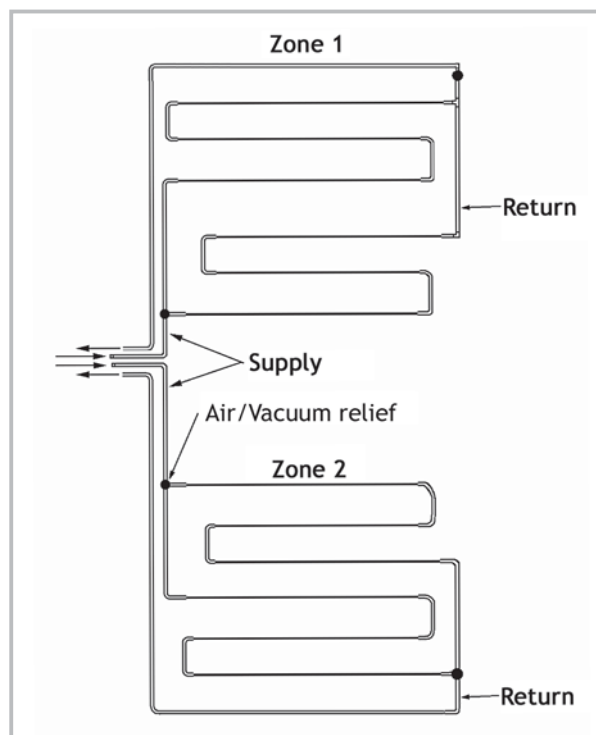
Subsurface drip field layout with looped lines (plan view).
